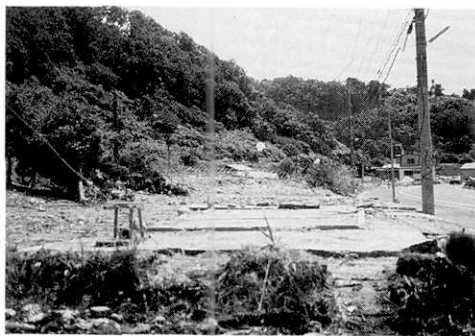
Traces of swept away houses at Hirahama in Taisei Town.
